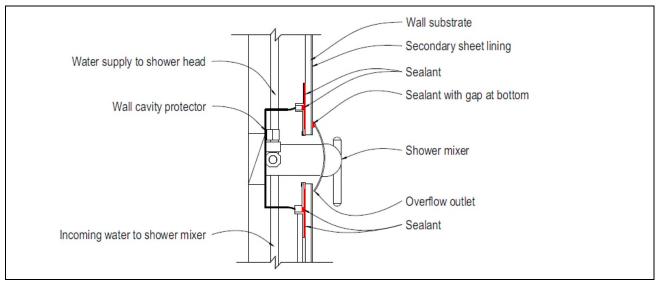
Waterproof sealing around wall penetration in shower area with a secondary sheet lining
